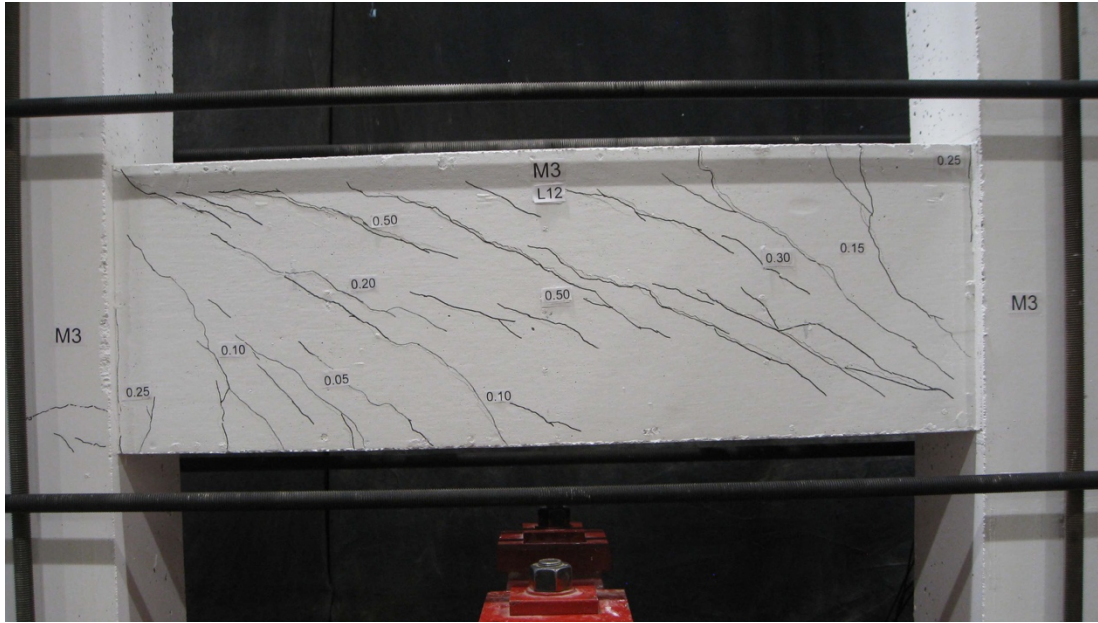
Crack pattern and width at a shear of 384 kN for specimen M3
